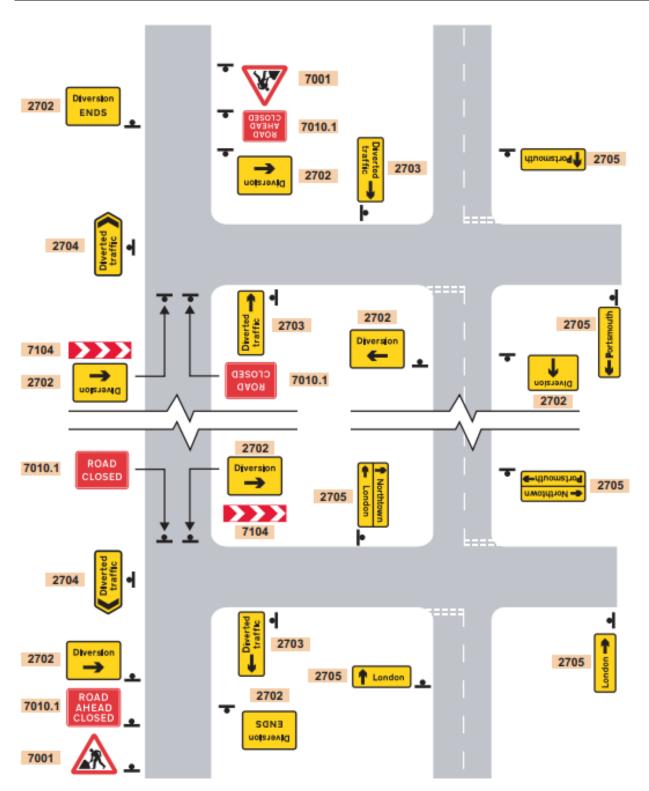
Layout of signs for road works on single carriageway roads with diversions
